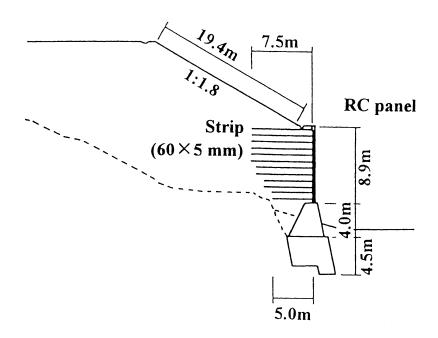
Cross section of the Reinforced Earth wall that suffered some damage (Tatsuoka et al. 1996a)
